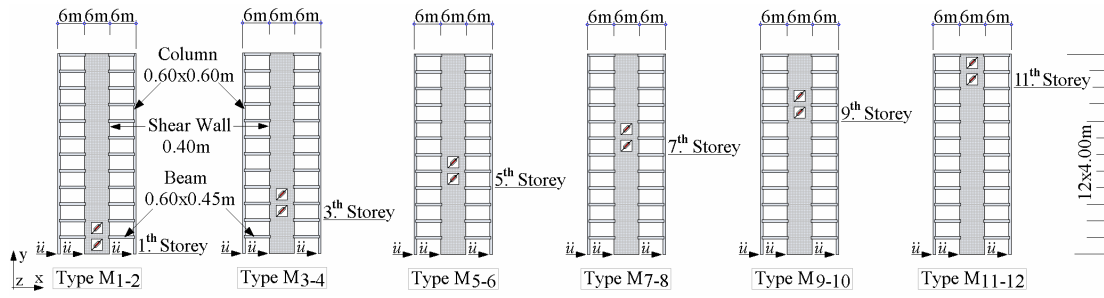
Placement of dampers within 12-storey frame-shear wall structures.
